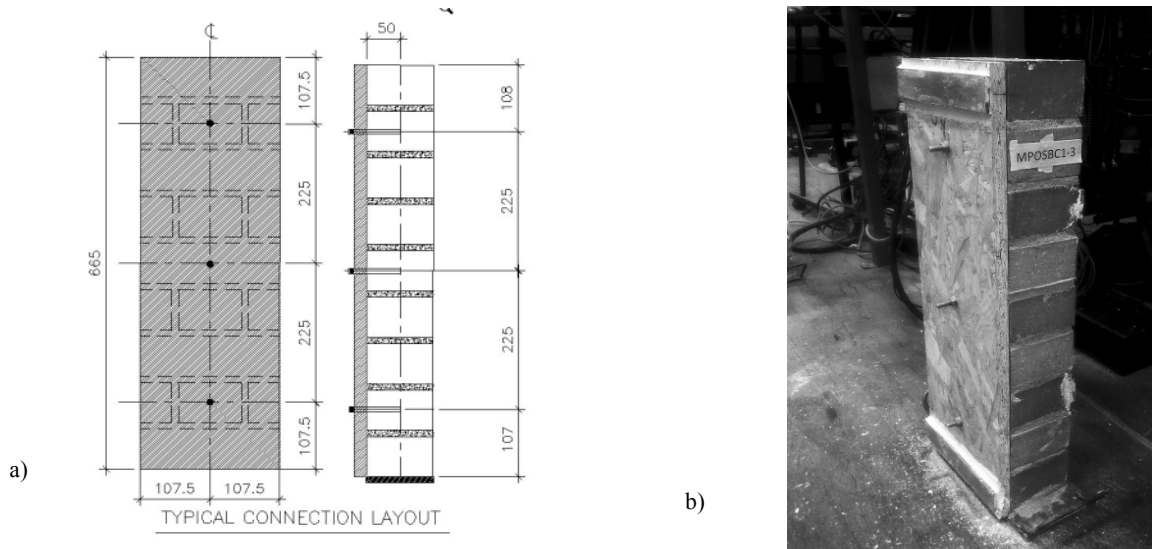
Retrofitted Masonry Prism: (a) Drawing (front and side view), (b) As-built specimen
